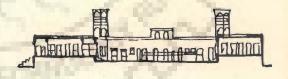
Section of Fekri House in Bandar Lengeh
